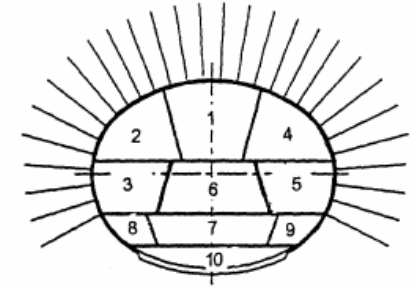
Top heading and bench method of excavation. Temporary support consists of a 200 mm thick shotcrete shell with 4 and 6 m long untensioned grouted rockbolts at 1.0 - 1.5 m spacing
